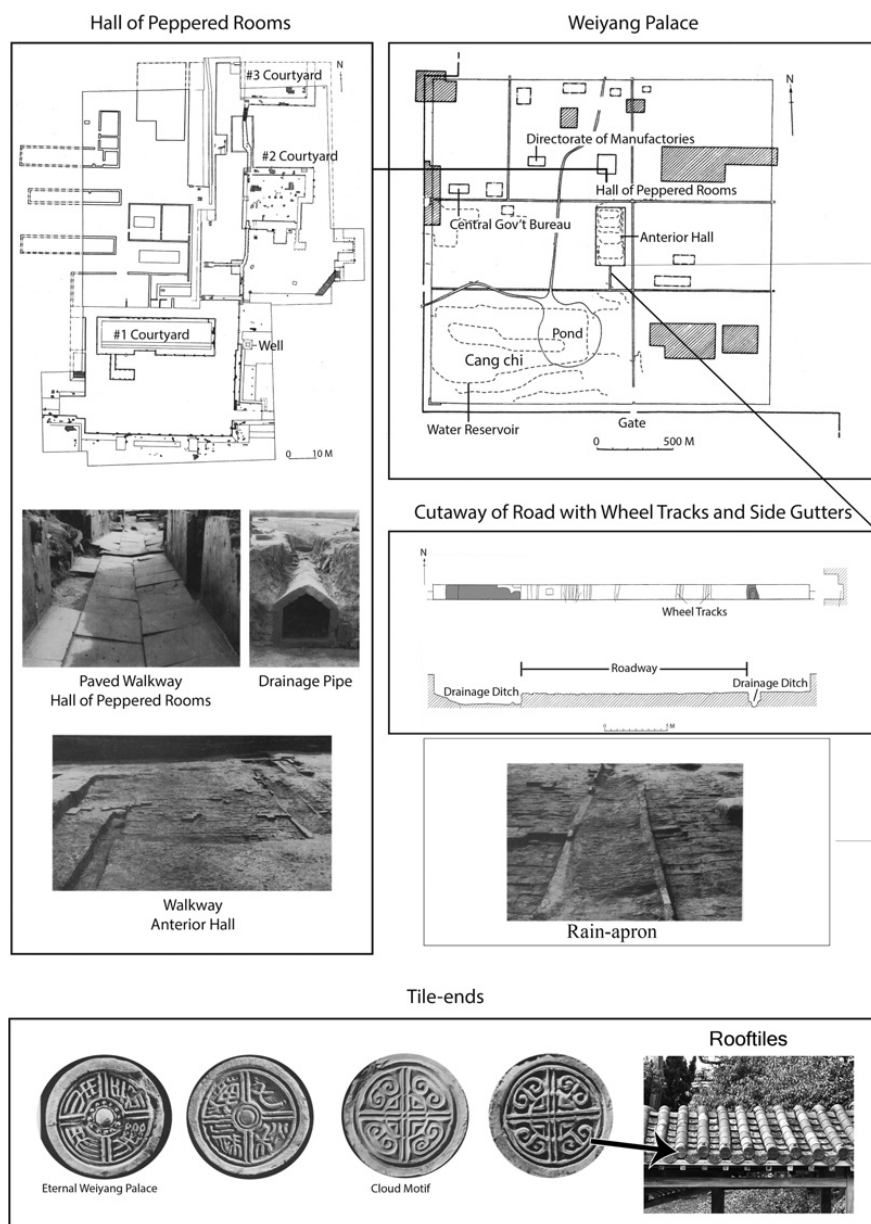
Layout of Weiyang Palace and the imperial architectural inventory. Plan of Hall of Peppered Rooms, roof tiles, and drainage features associated with Anterior Hall (after IA CASS 1996b, 4, 189, 208, 231, plates 239 and 244). Road cut showing exposed wheel tracks and side gutters (after Zhang, J. 2016, 163). Tiled rooftop is from the garden grounds of the National Palace Museum in Taipei (photo by Alice Yao).
